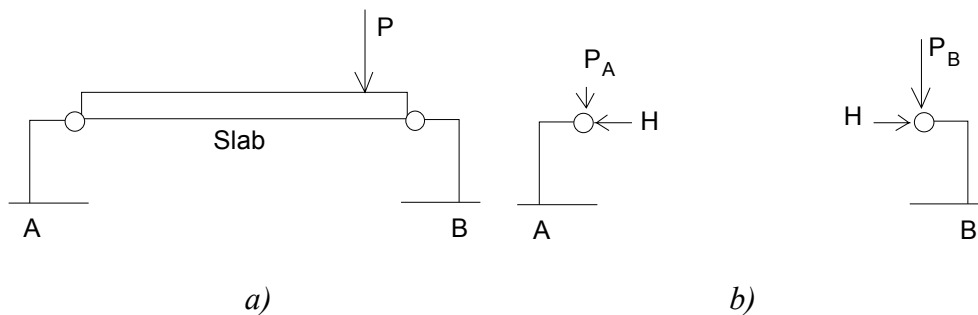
Schematic diagram about behaviour of supporting beams A and B. a) Mechanical model. b) Forces on beams.
